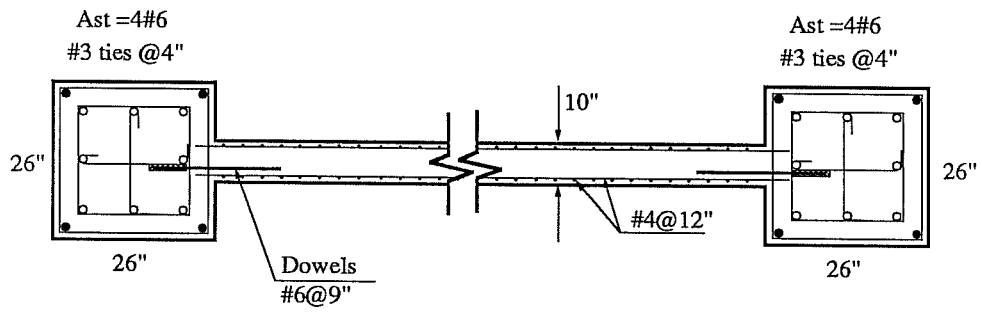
Strengthening Scheme W3 - Cross Section Details
